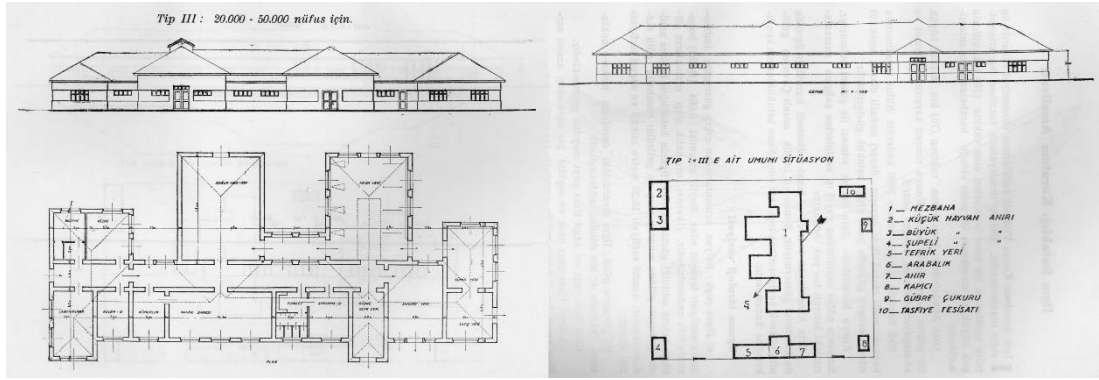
Ground floor plan, elevations and site plan of type-3 slaughterhouse (Source: T.C. Bayındırlık Bakanlığı Bayındırlık İşleri Dergisi Yönetmelik Kısım. (1936). 'Fennî Mezbahe Binaları' 2(12), pp. 44-51.)
